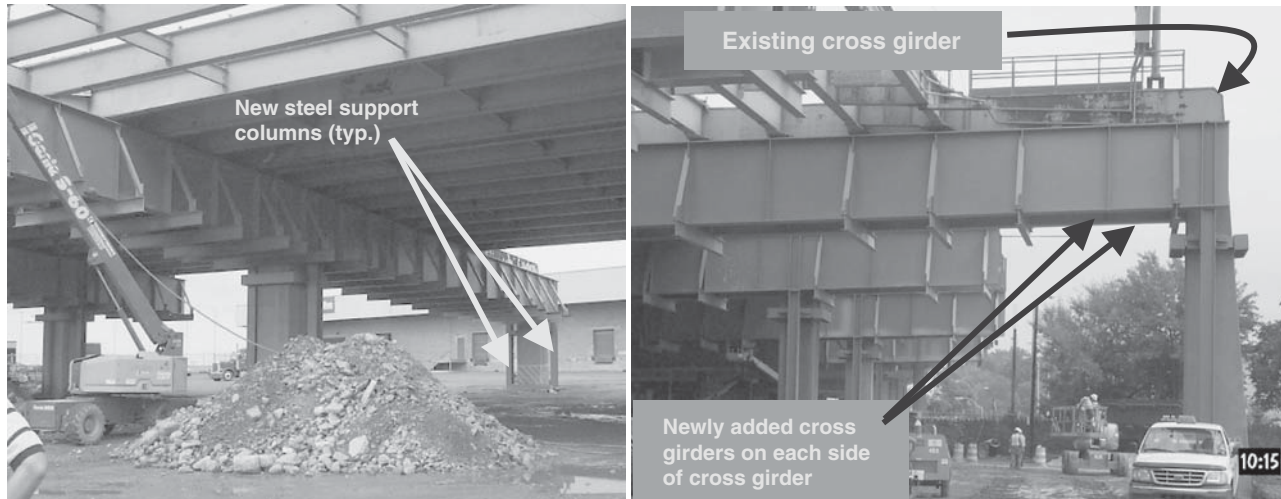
Additional support girders are used to provide redundancy to steel cross girders on I-95 bridge north of Philadelphia, Pennsylvania.
